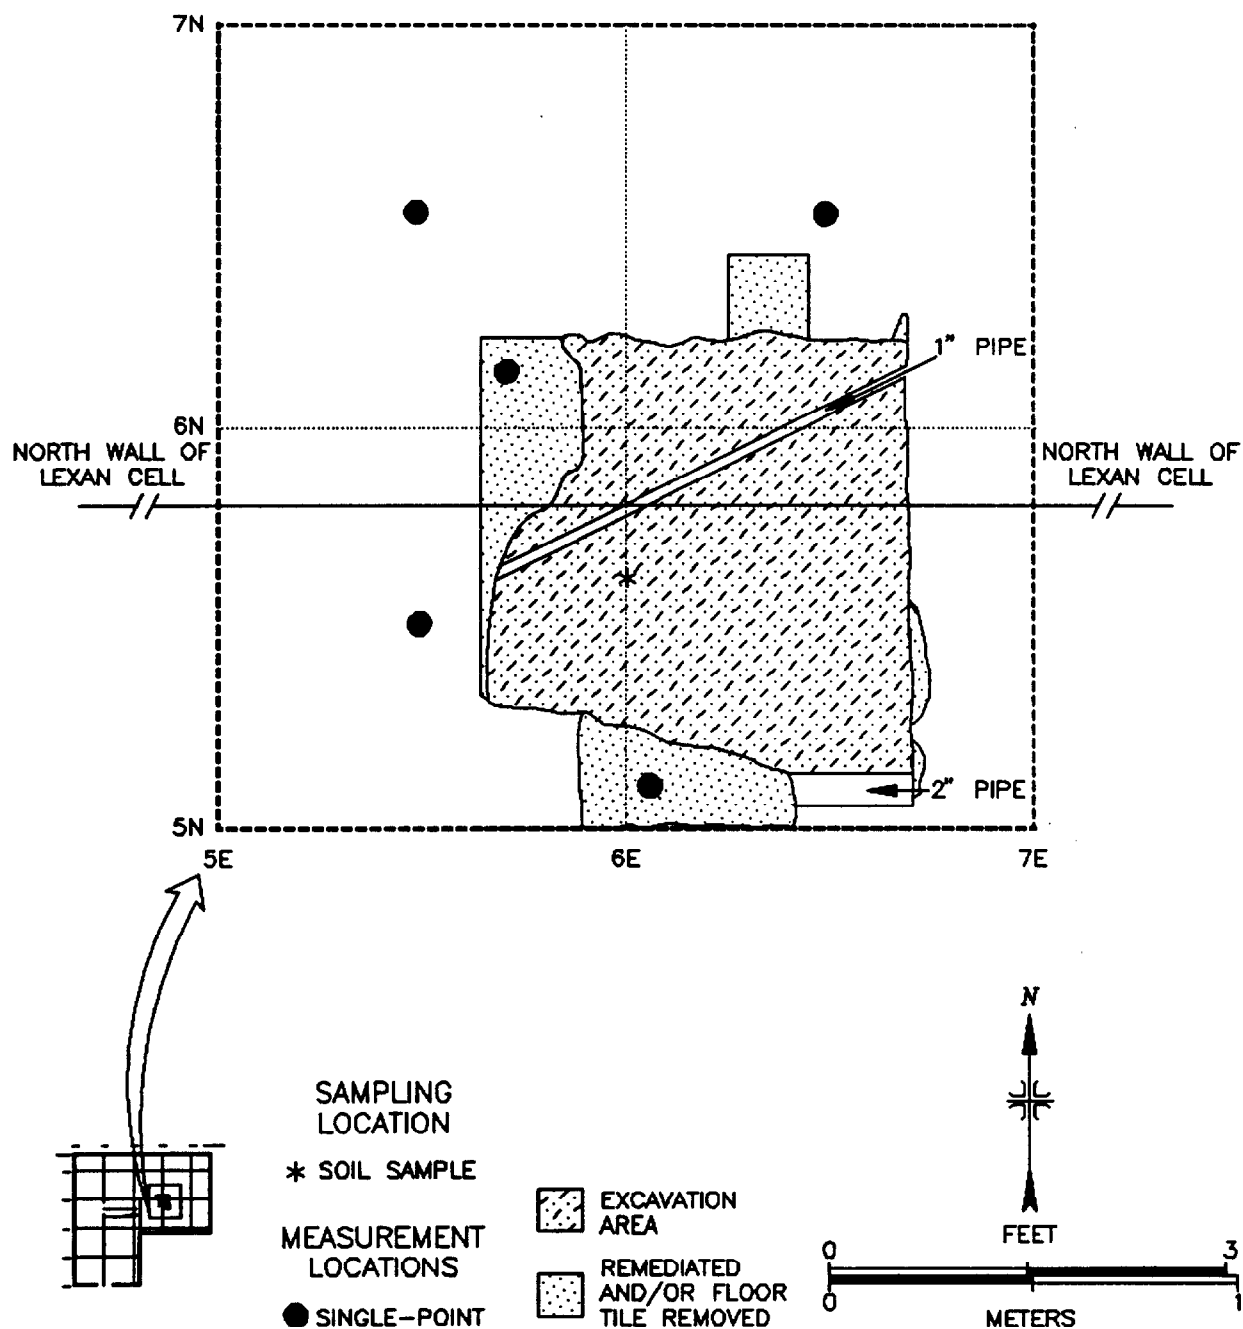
Building 28, First Floor, Lab 13 Breakout of Remediated Area – Remediated Area and Measurement and Sampling Locations
